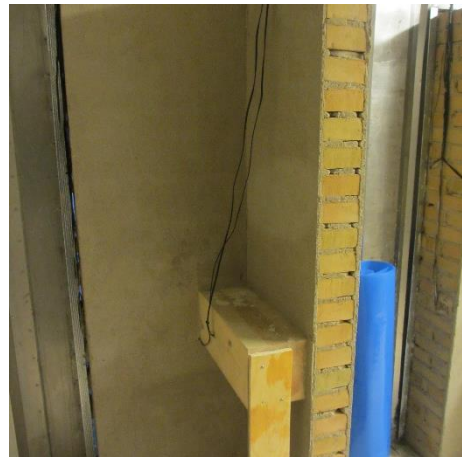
Finished solid masonry wall with wooden beam, before installing vapour barrier and thermal insulation at the boundaries of the wall.
